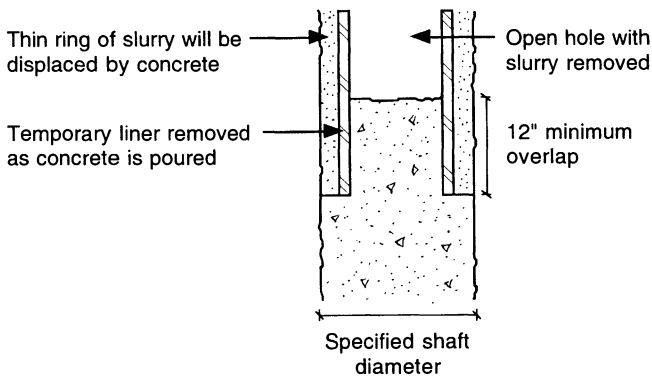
Procedure for removal of a steel liner during the pouring of concrete.
